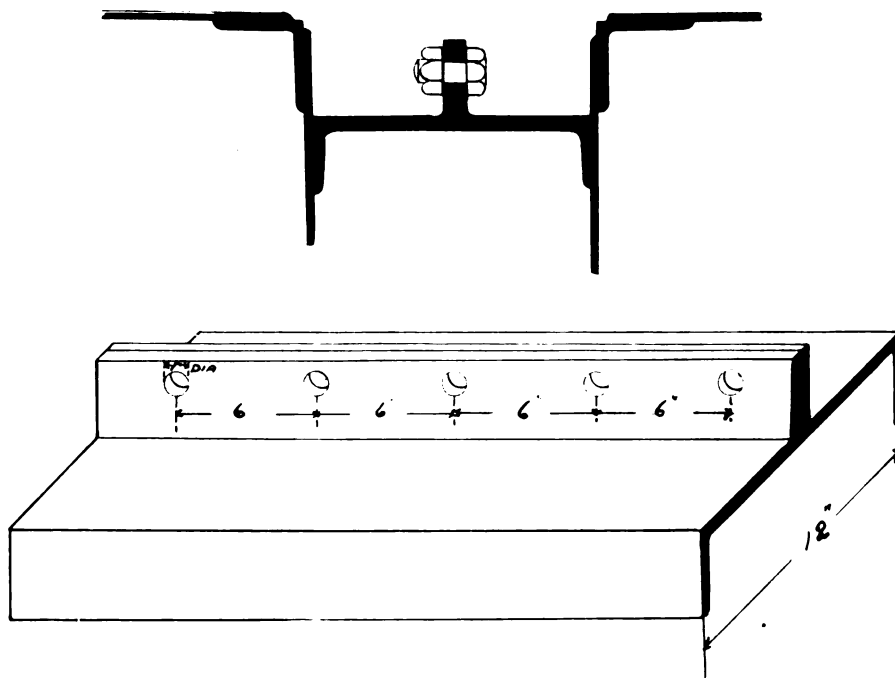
DETAIL OF FASTENING PARTS TOGETHER.
